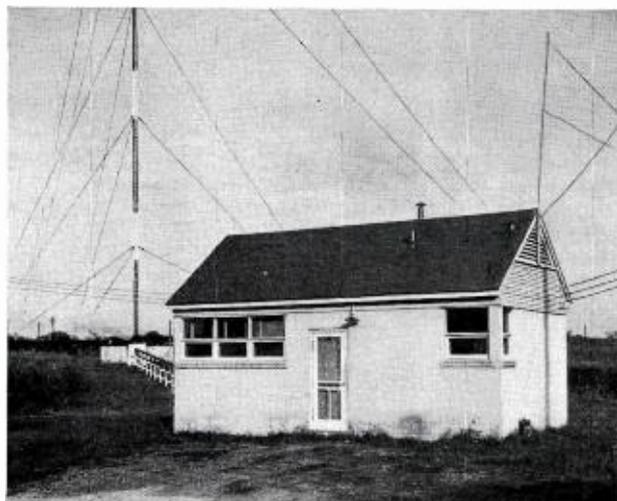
The WHHM transmitter building is constructed of concrete blocks. The windows were built near the ceiling, permitting a maximum amount of wall space and light.
